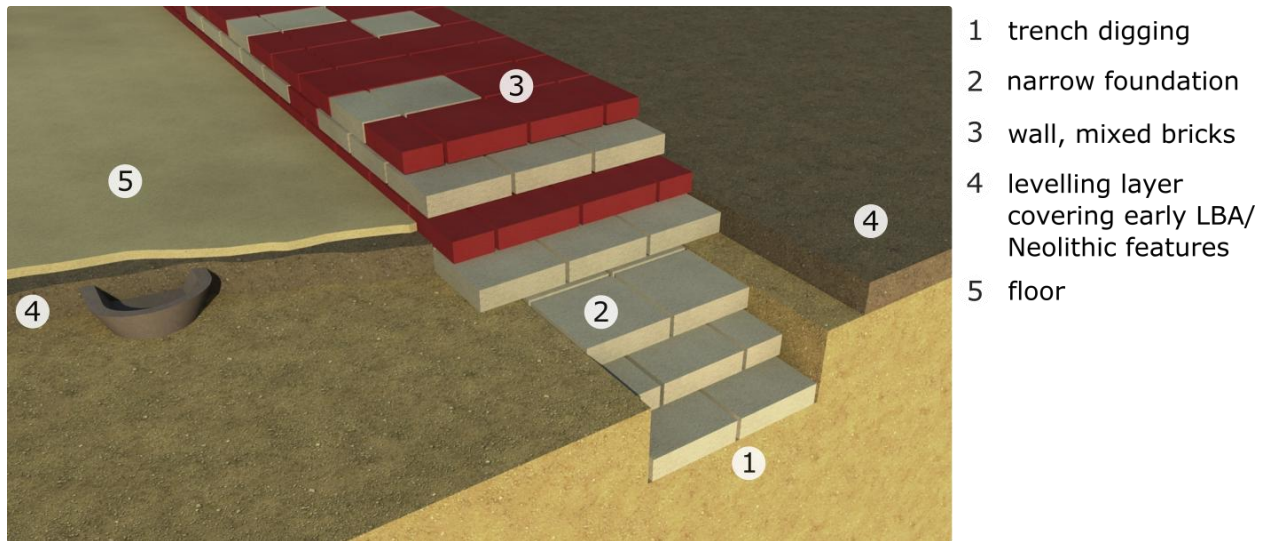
Interpretation of excavation data for interior load bearing north-south walls of residence. Showing the receding foundation, and dumping of soil as levelling layer.
